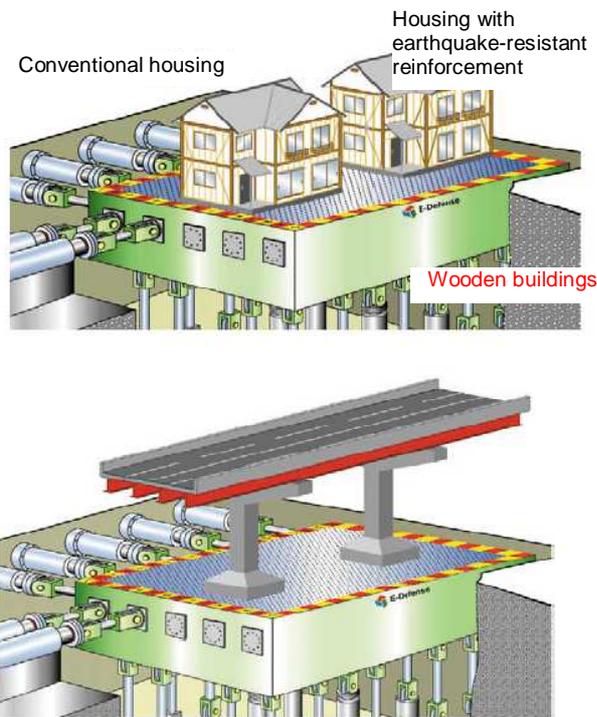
Full-size destructive testing of wooden buildings and bridge structures
